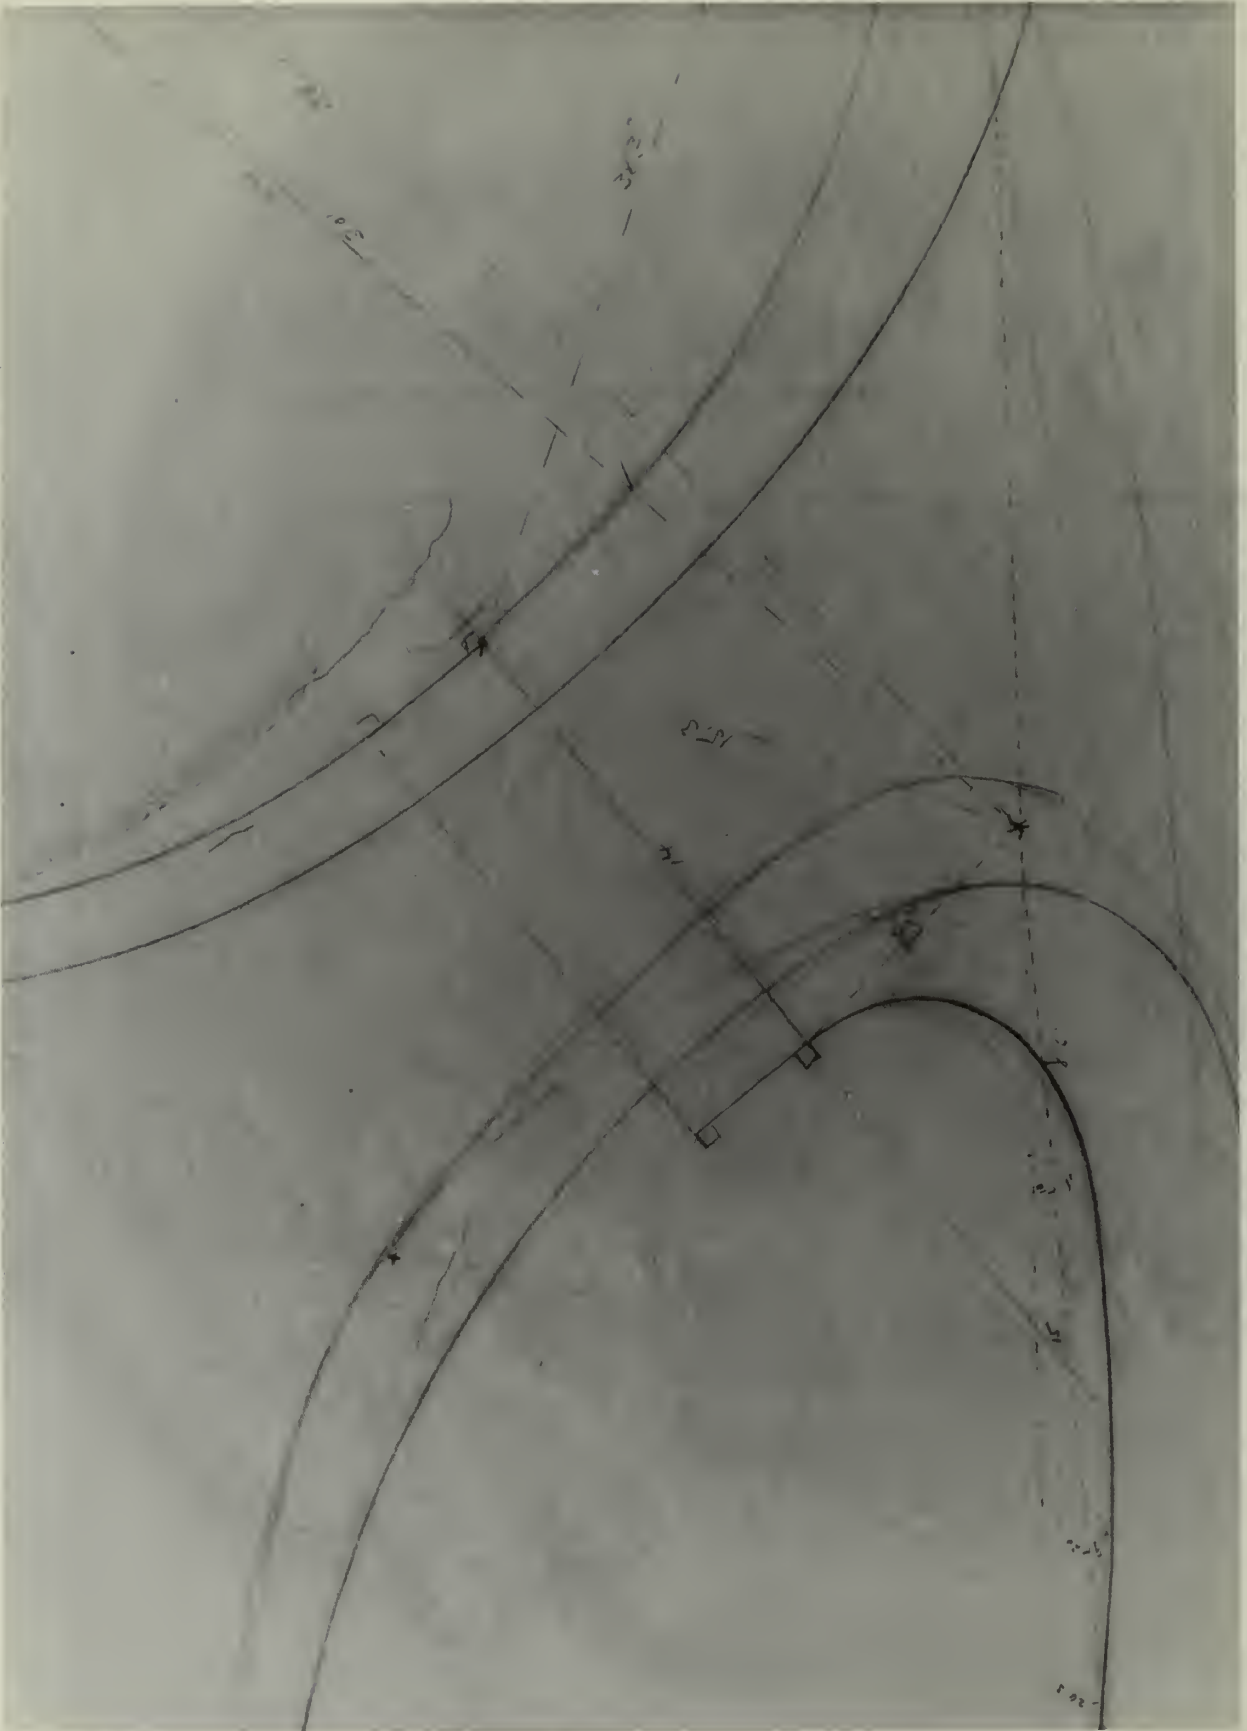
Spruce pole fence: site plan for front driveway arch, circa 1883.
